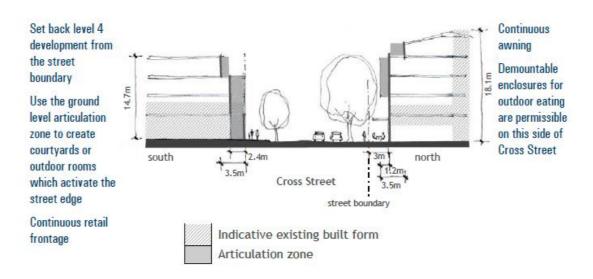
Cross Street Cross Section - D5.4.7 of Woollahra Development Control Plan.
